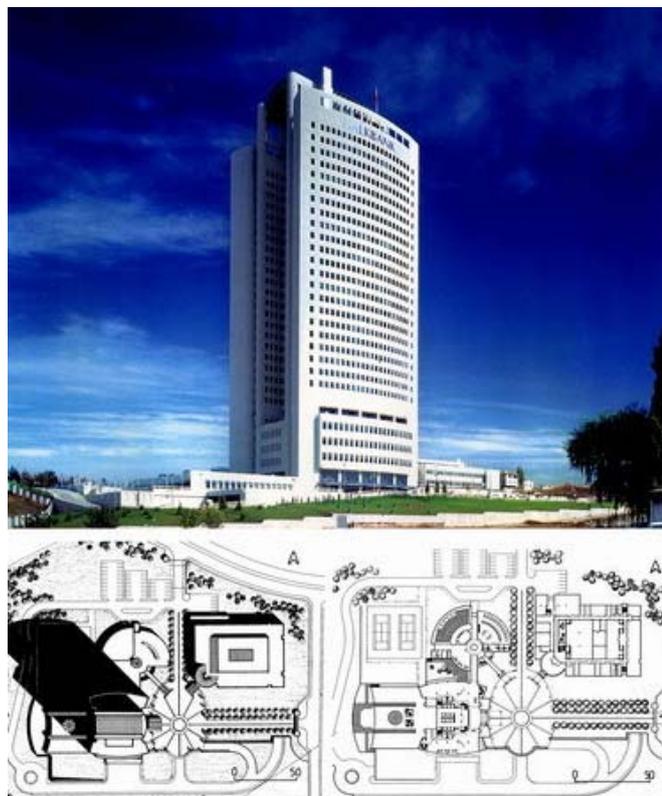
Halkbank Headquarters - Ground Floor Plans and View
